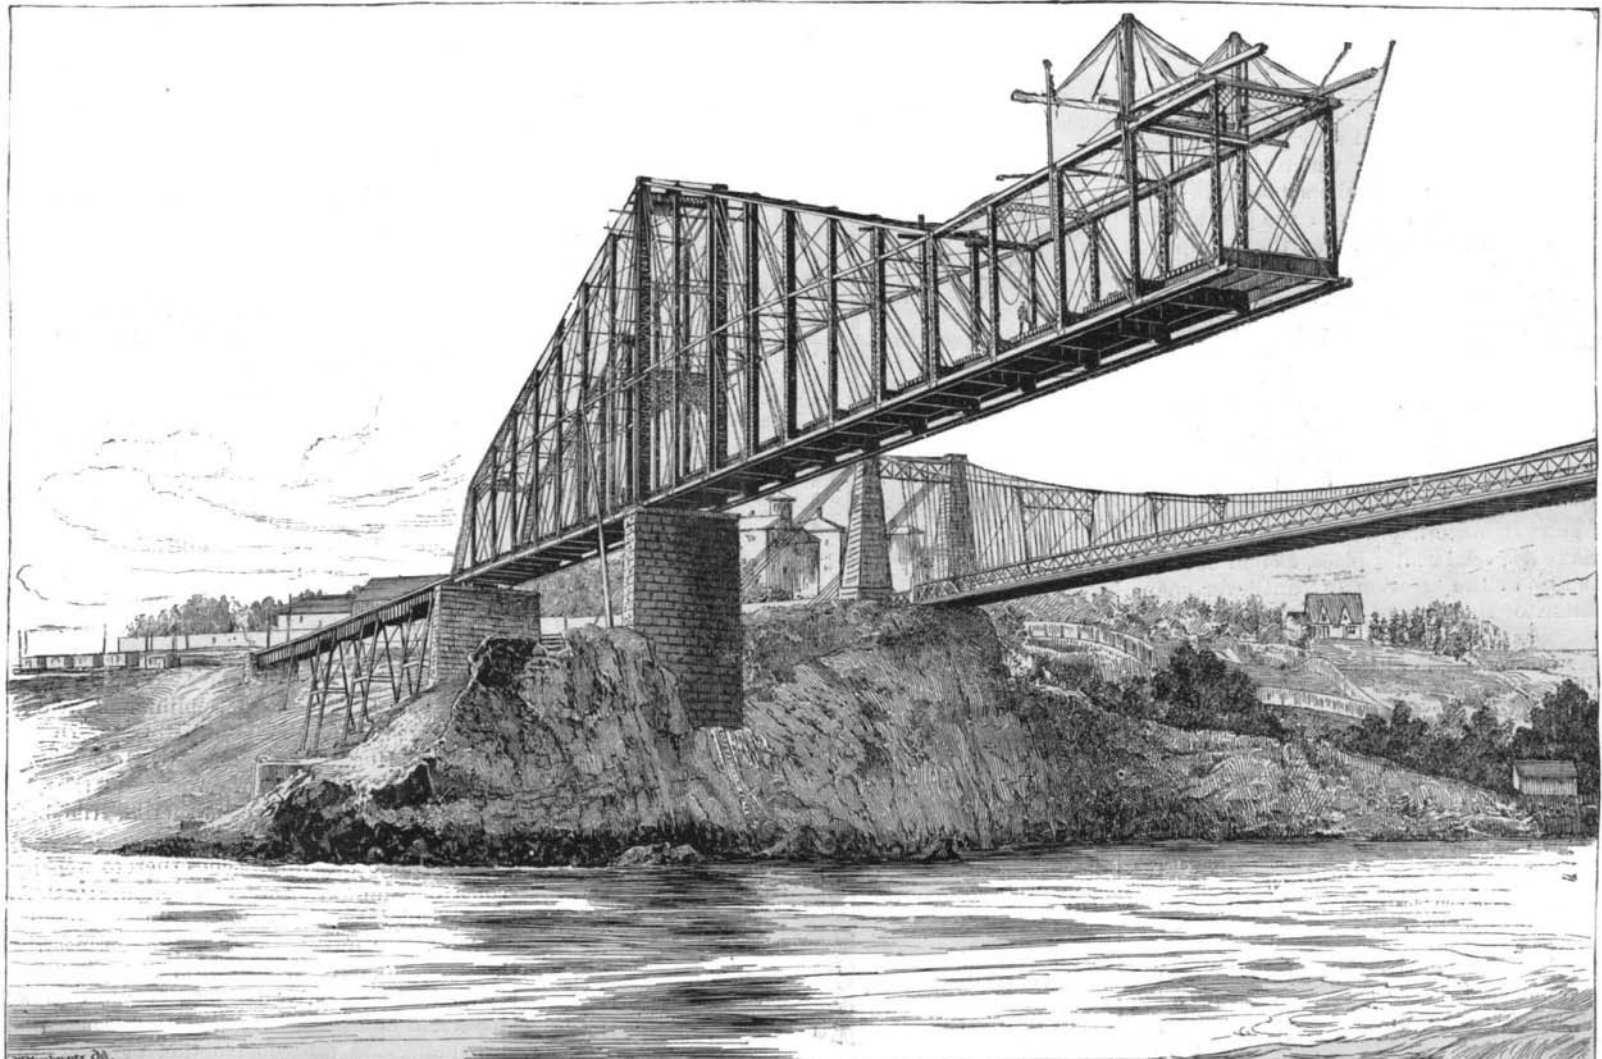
WEST SHORE ARM AND HALF OF RIVER SPAN, AS ERECTED, PROJECTING 262½ FEET BEYOND FACE OF PIER.
